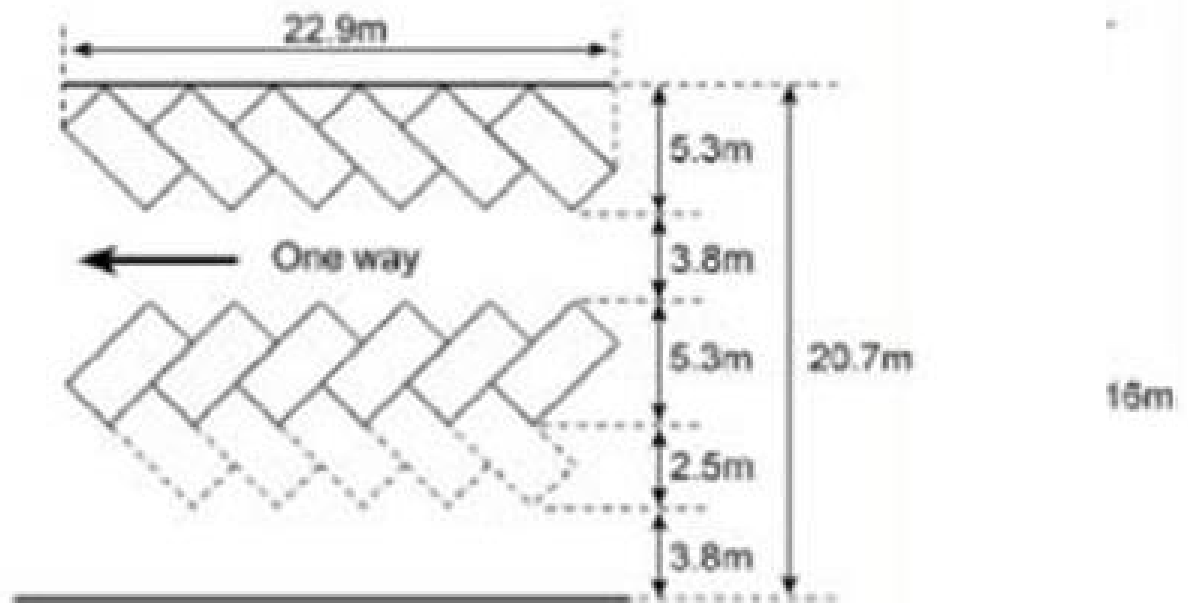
Typical one-way flow 45 degree angled parking layout
